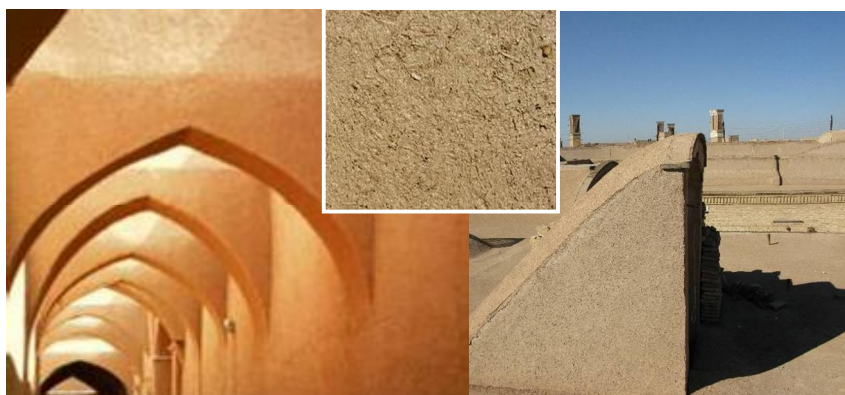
Fibre reinforced clay plaster on walls and roofs (Yazd, Iran).
